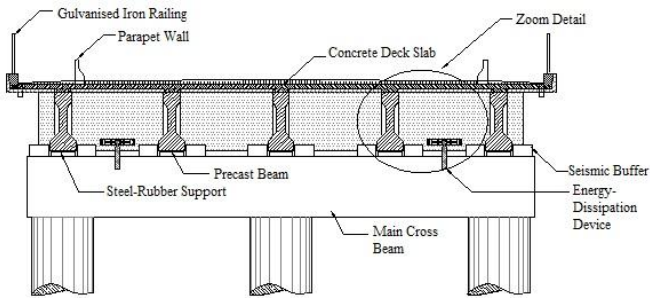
Cross Section of the bridge- Position of the Metallic Damper
